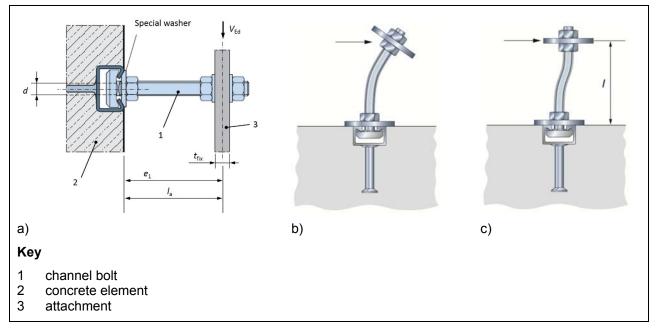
Shear load with lever arm: a) Definition of lever arm; b) free rotation of the fixture; c) no rotation of fixture
